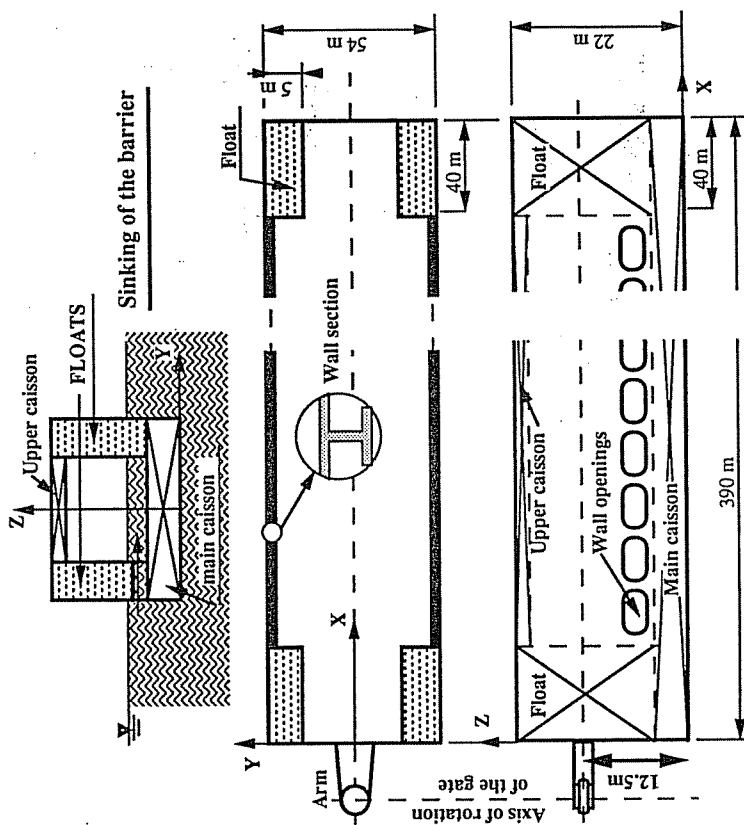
Details of the floating barrier (cross section, plan view and front view).
